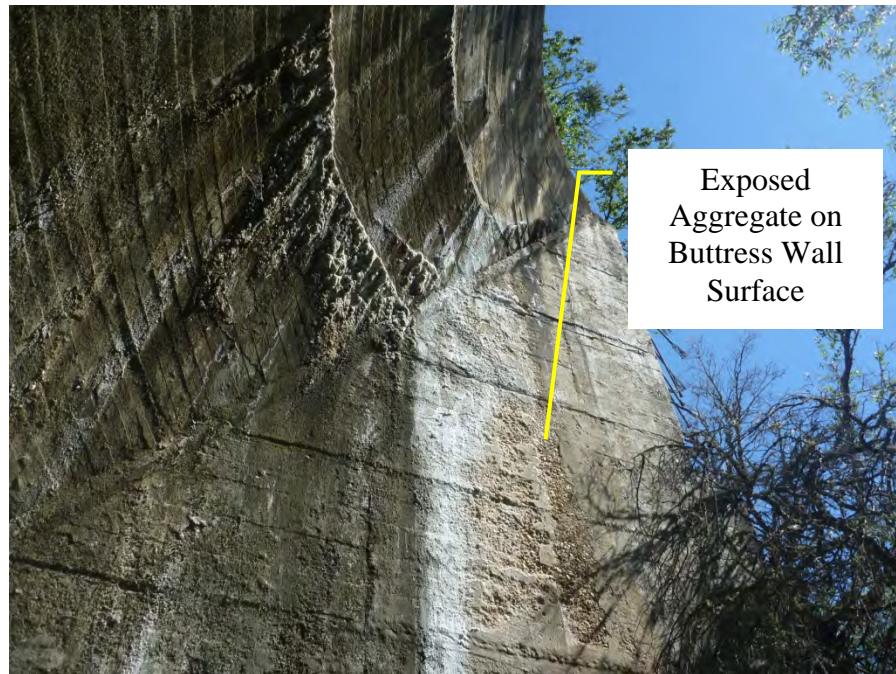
Buttress Brace with Spalled Concrete and Exposed Cable
